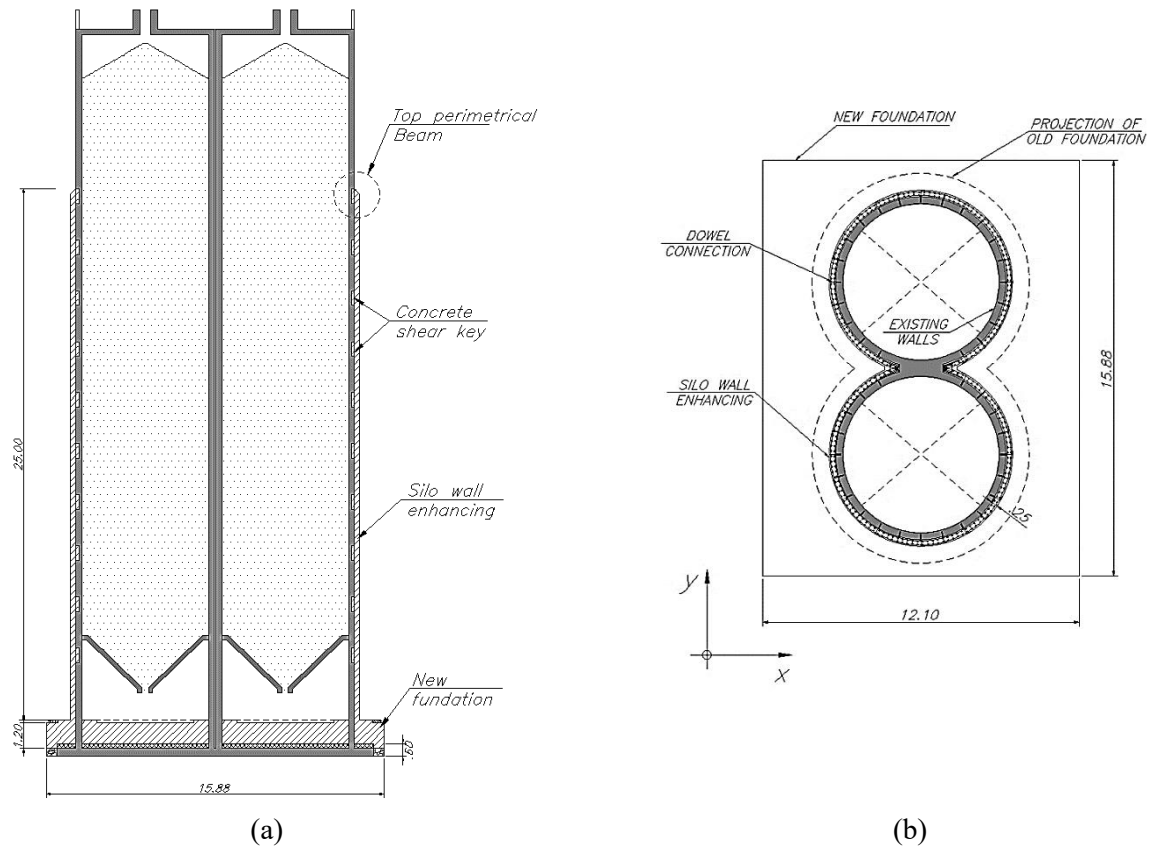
Views of retrofitted RC silos. (a) Elevation, and (b) Plan.
